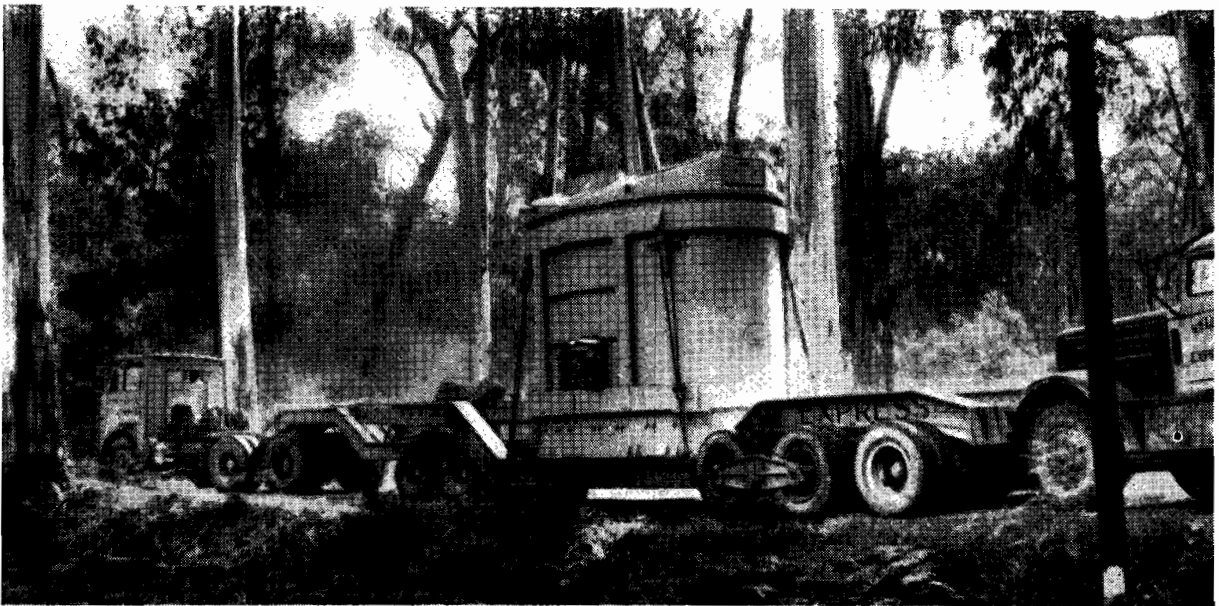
A 40-ton S.E.C. transformer on Maroondah Highway en route to Eildon Project.
